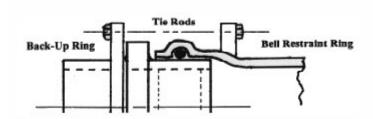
HDPE to PVC Slip-Joint Anchor Configurations
